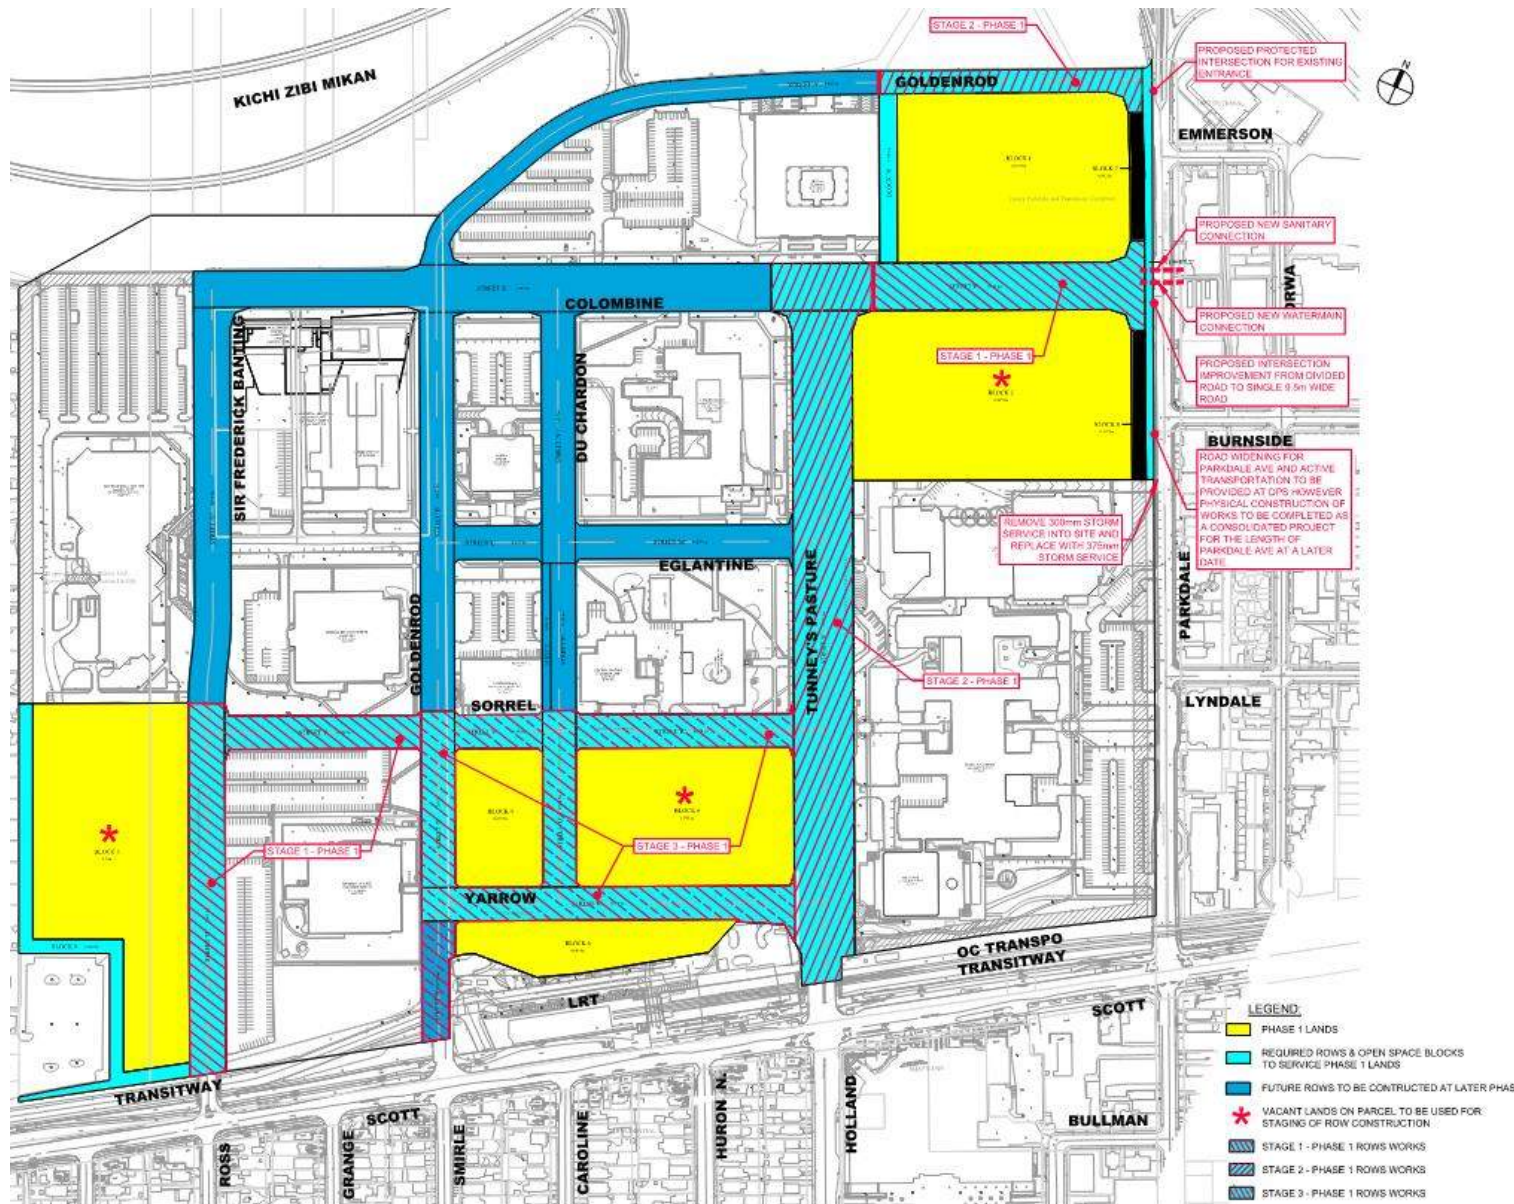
Road Infrastructure Redevelopment Plan via Arcadis (2025-08-27)
